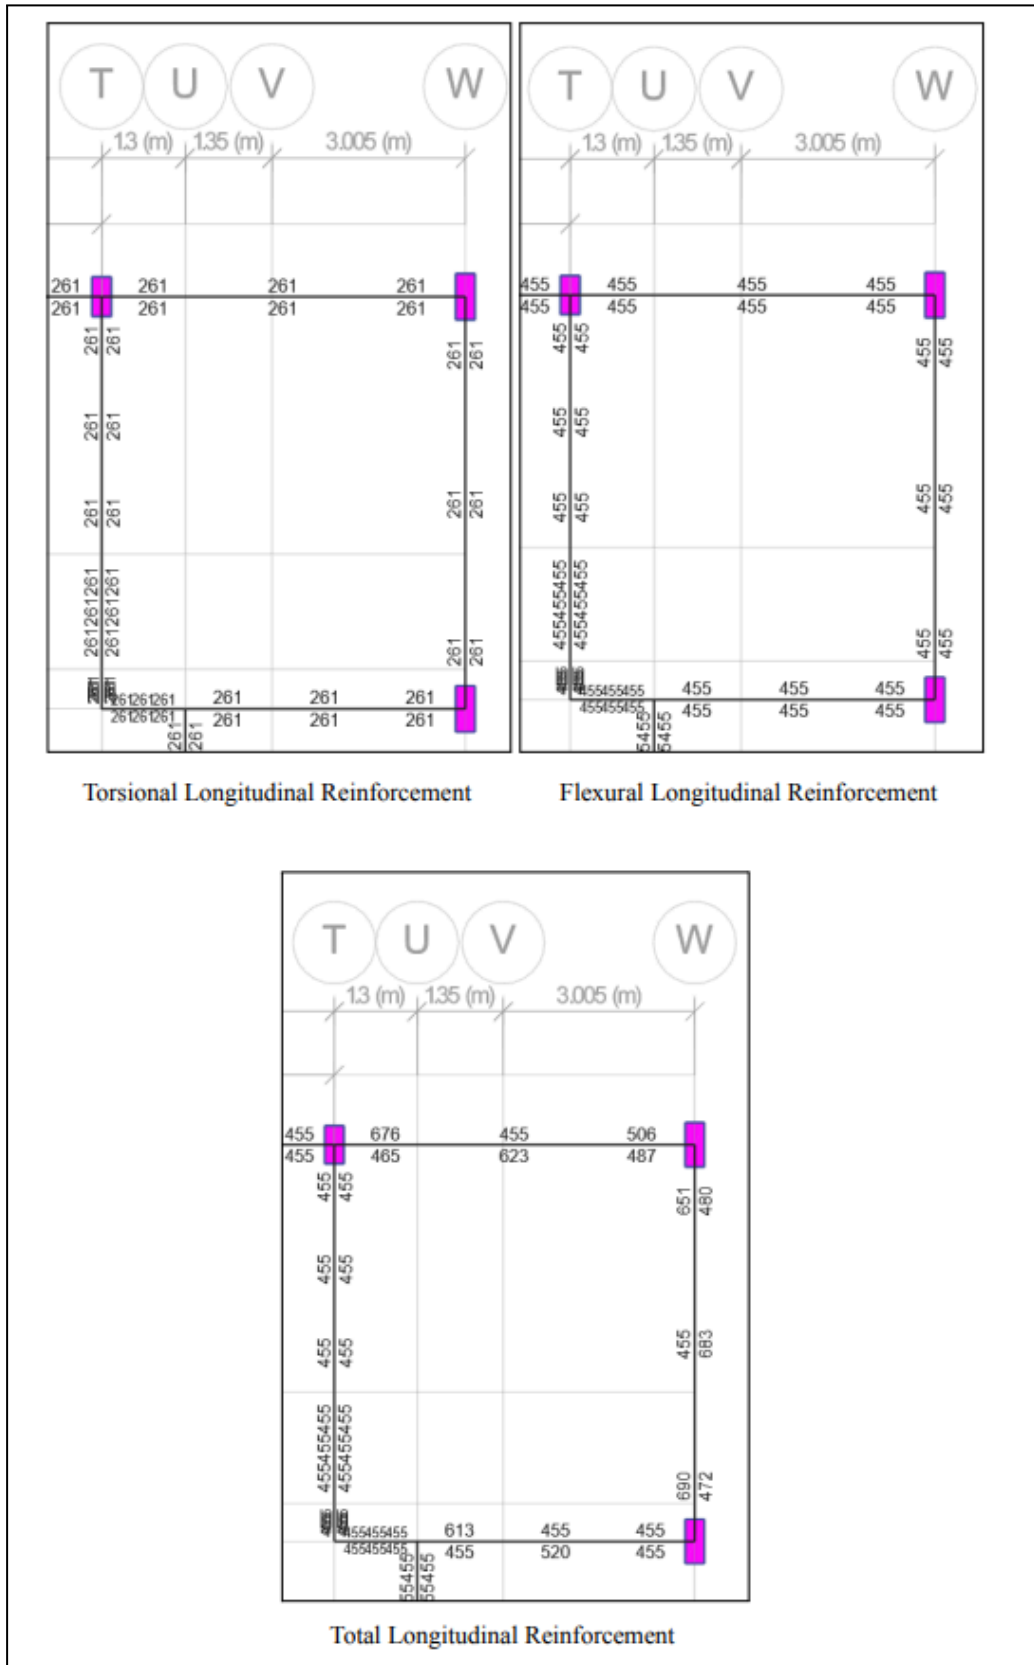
Longitudinal Reinforcement in column-supported beams (ETABS Output).
